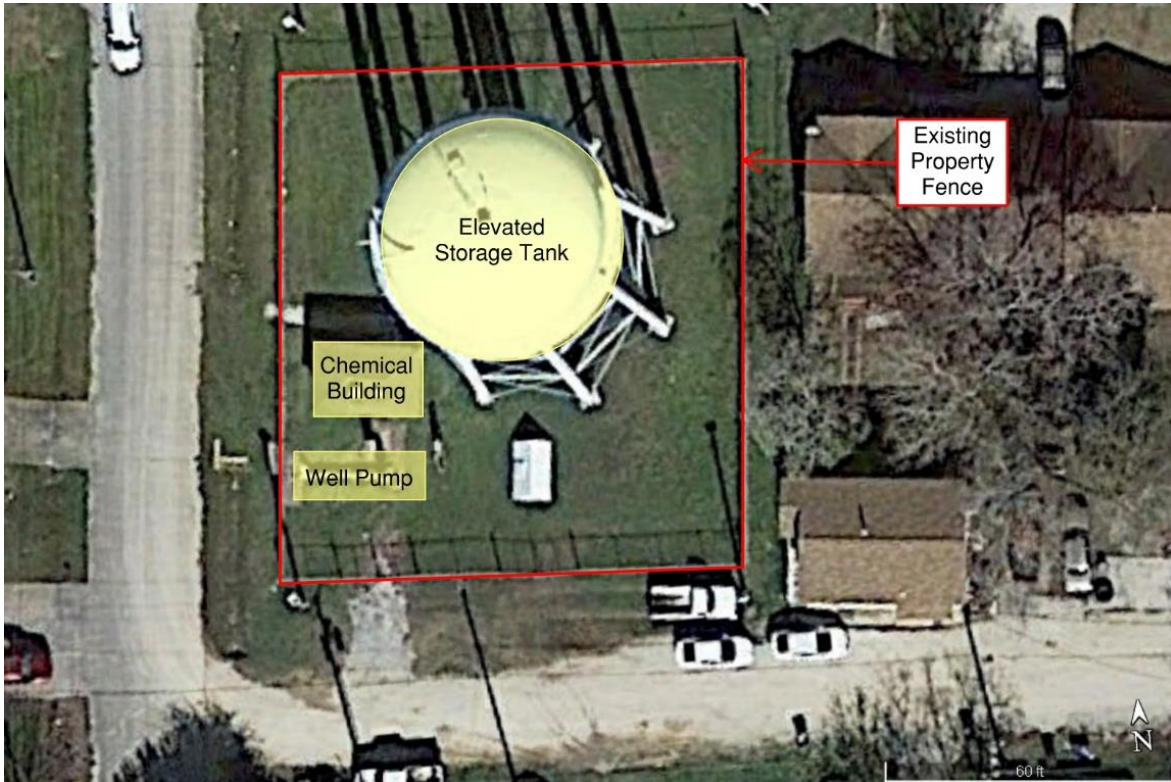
Bay City 6th St and Katy Ave WTP Existing Site Layout
